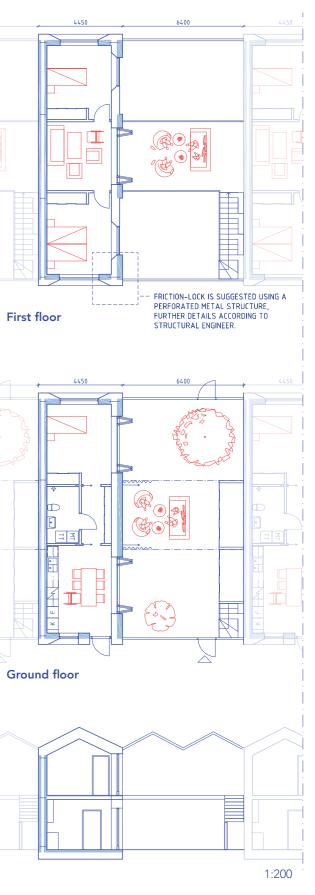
Adapted layout of the rowhouse. Light blue shading shows the placement of the rammed earth.
